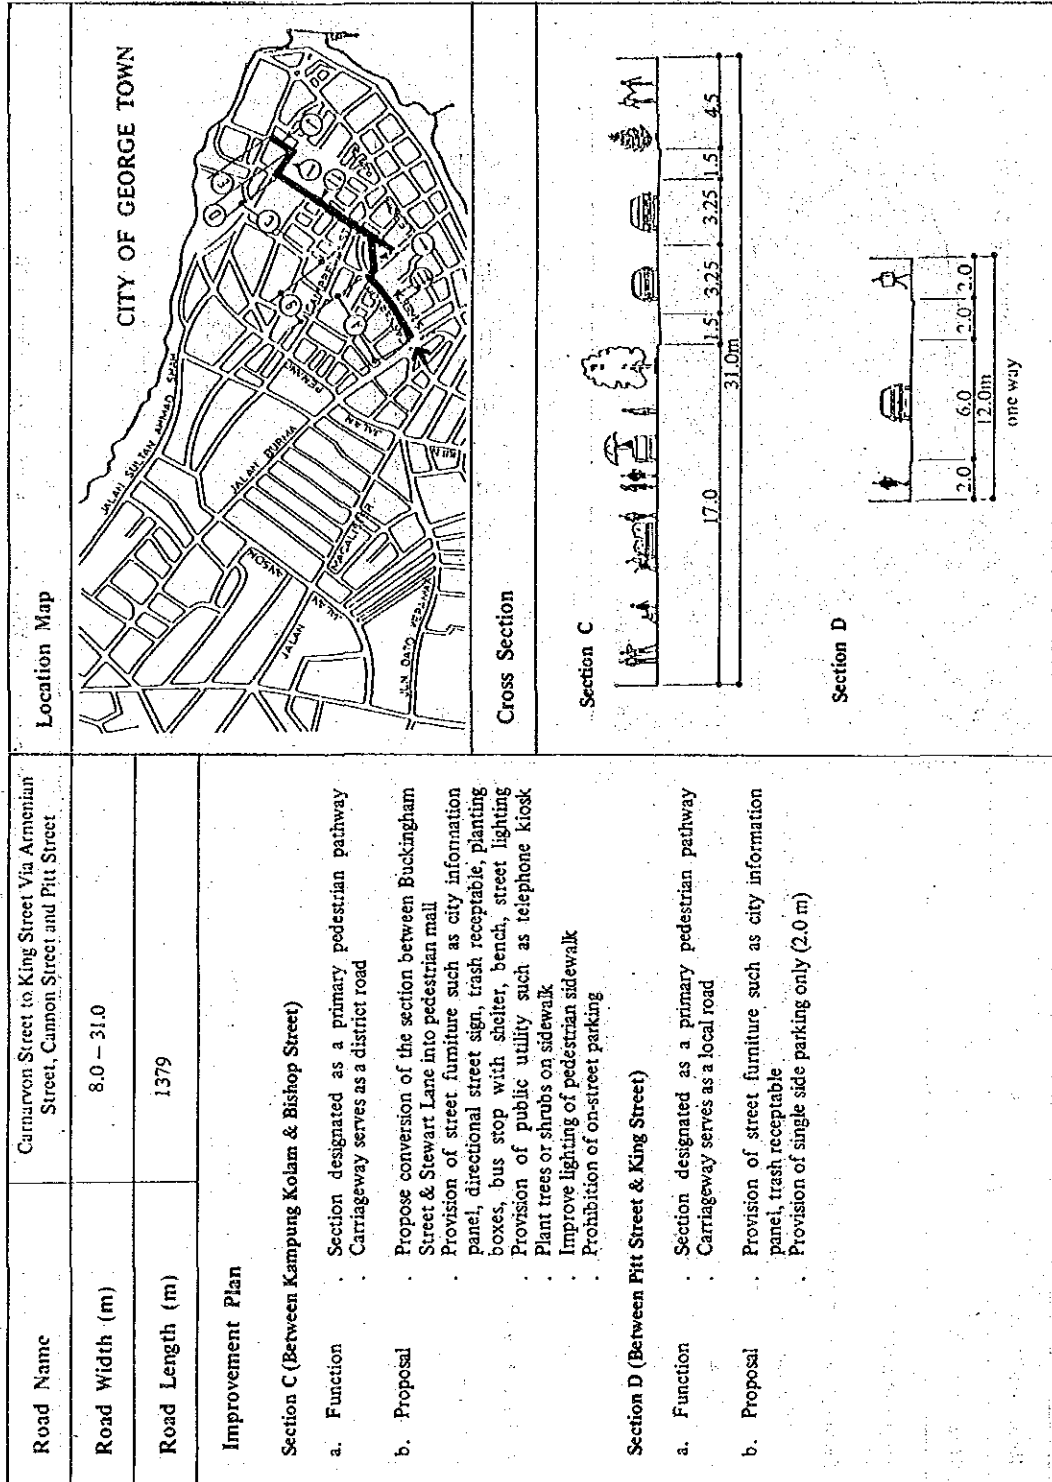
Pedestrianisation Improvement Plan (7) – Carnarvon St. to King St. Via Armenian St., Cannon St. & Pitt St.
